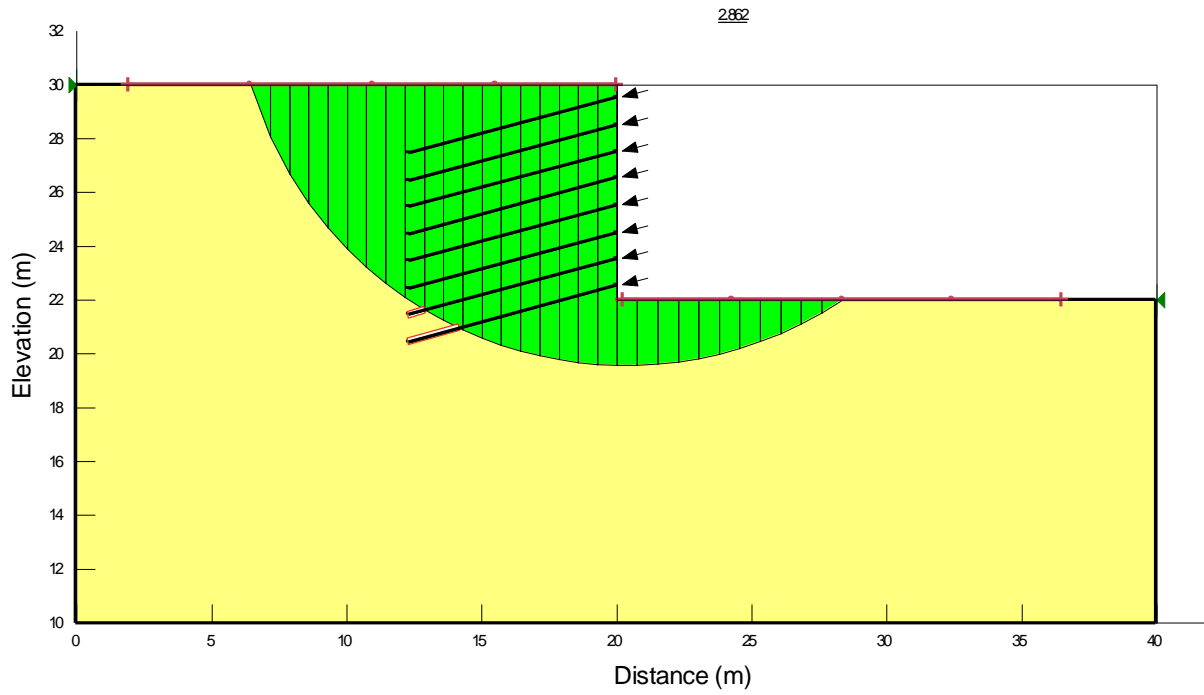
Failure Surface of Soil Nail Wall Using Slope/W
